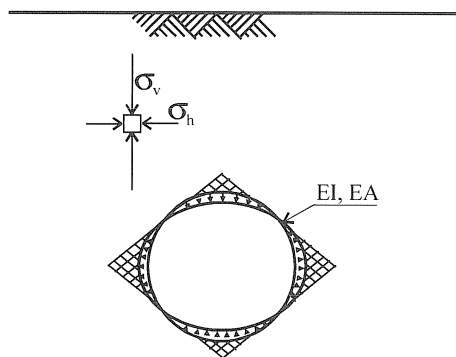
Compressive failure of a tunnel lining, in combination with soil failure around the tunnel. The feasible plastic zones are indicated.
